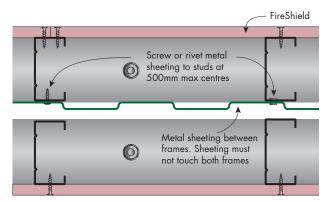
Metal Sheeting Double Stud Wall Plan view
